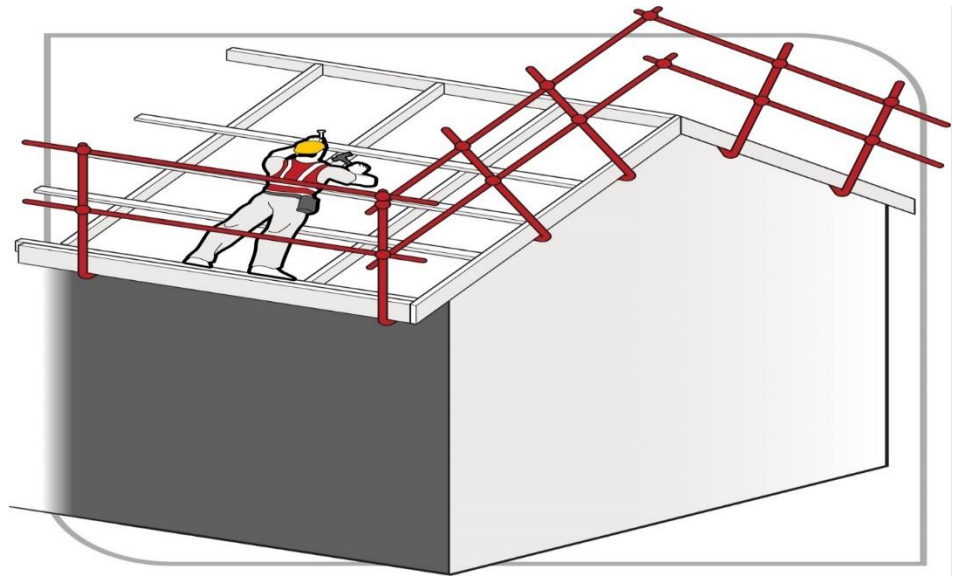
FIXING ROOF BATTENS TO TRUSSES.
